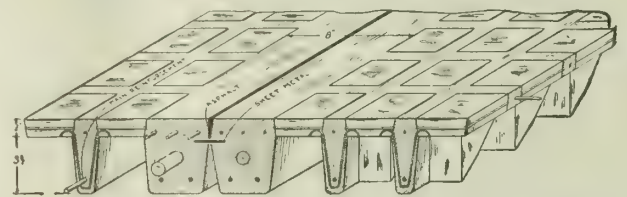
CROSS SECTION OF SIDEWALK LIGHTS, SHOWING EXPANSION JOINT
